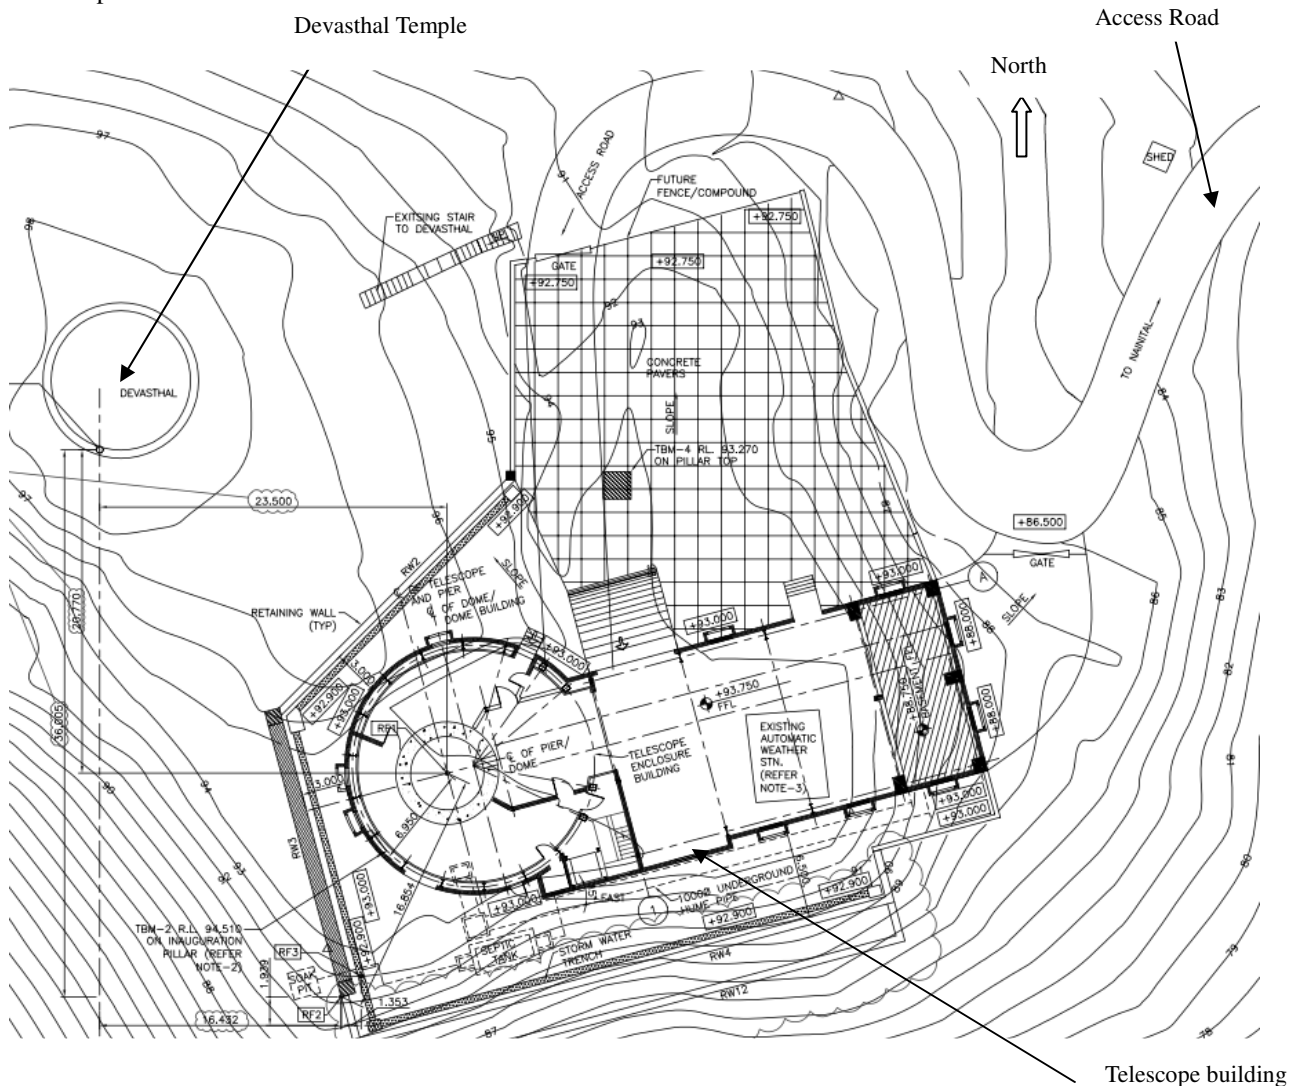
Devasthal Optical Telescope site plan showing telescope building
